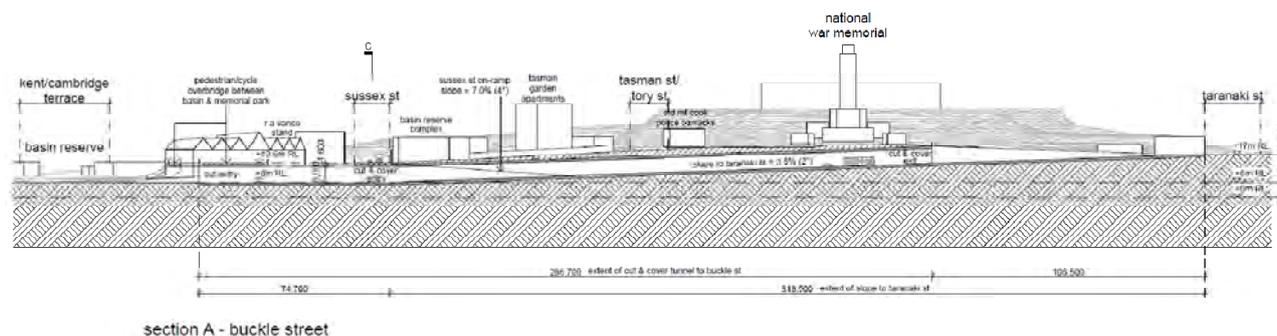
Option X tunnel long section. (source Architectural Centre)
